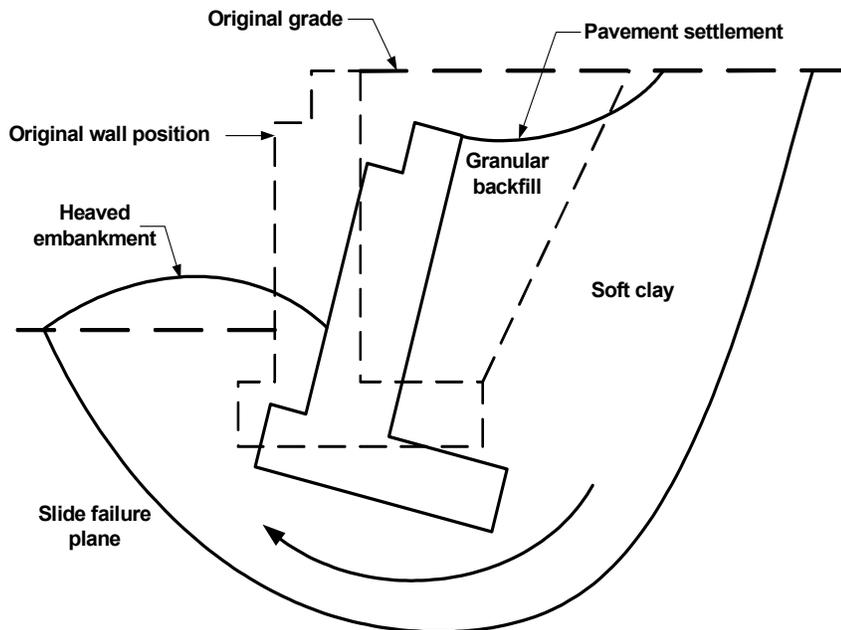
Lateral Movement of an Abutment due to Slope Failure
